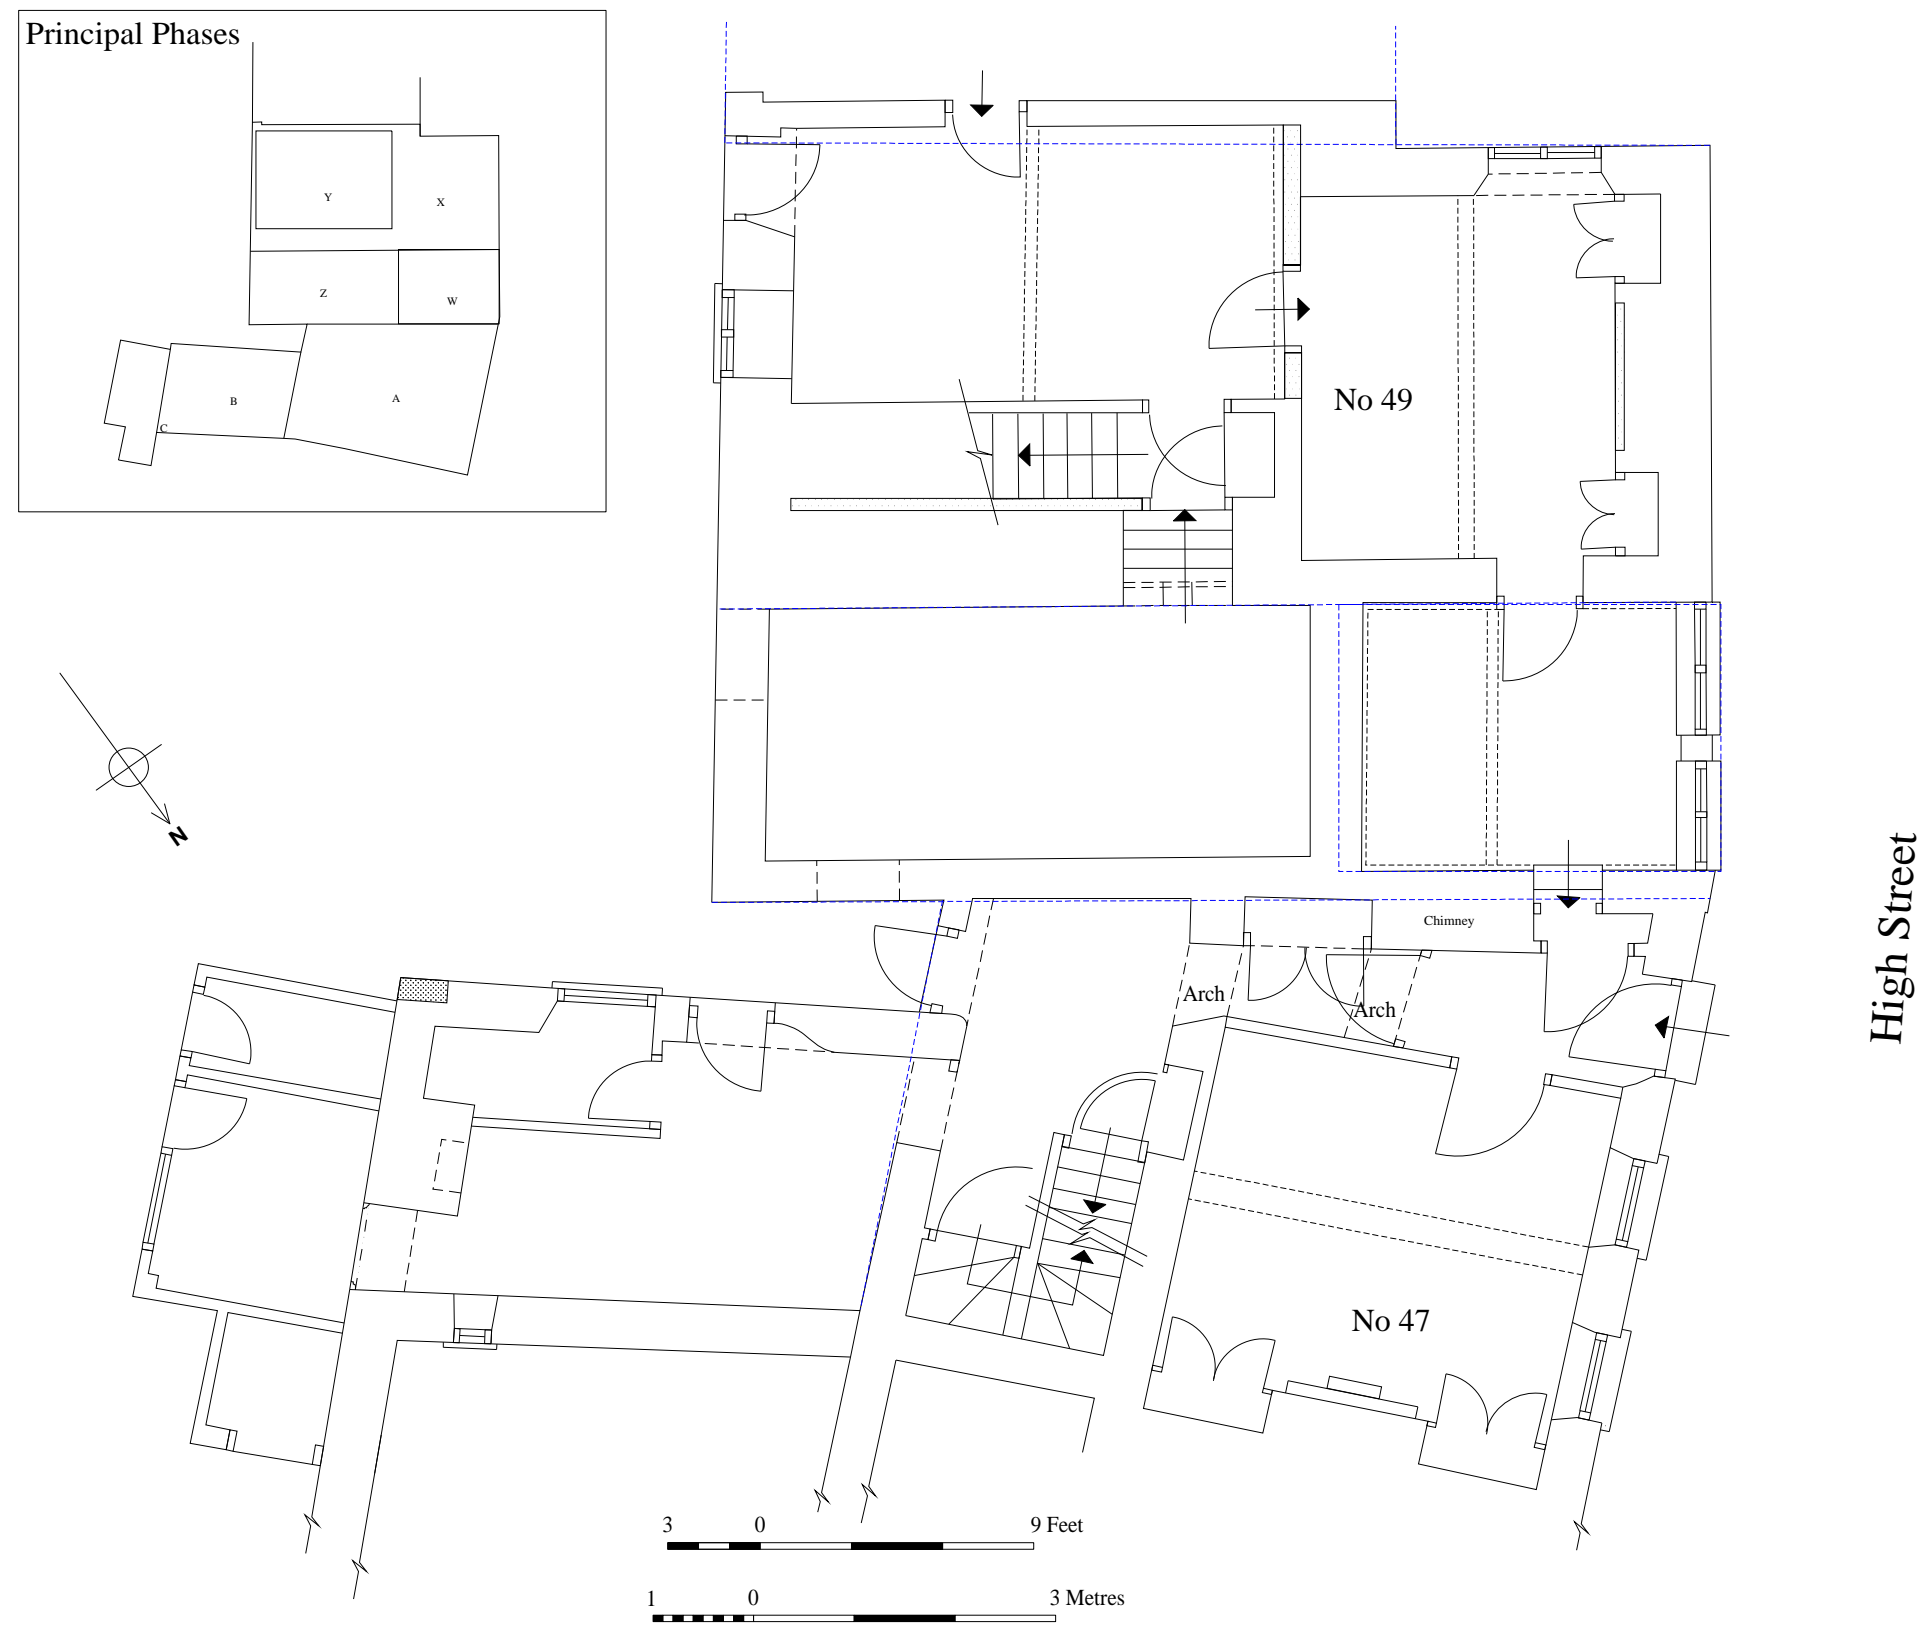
Ground Floor Plan (with principal building partitions in blue).
